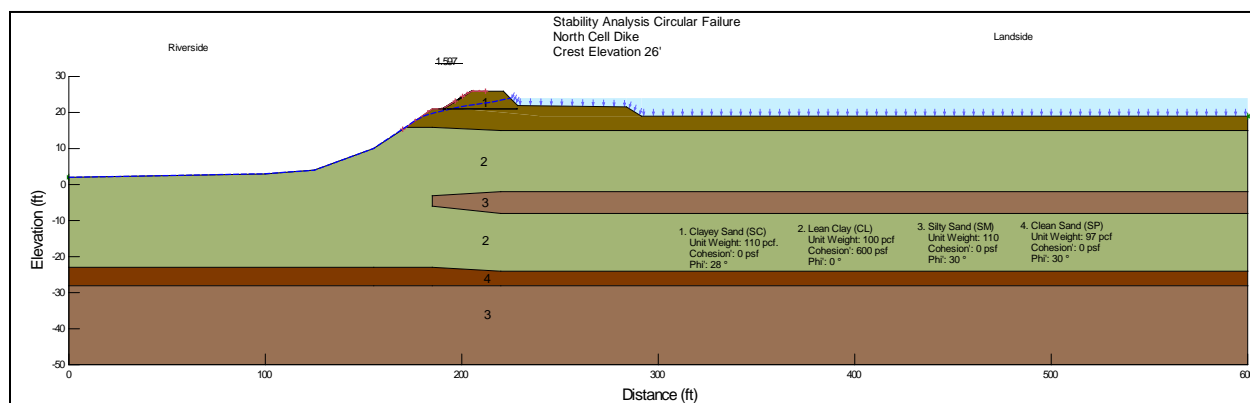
Circular failure, North Cell Dike, elevation 26'.
